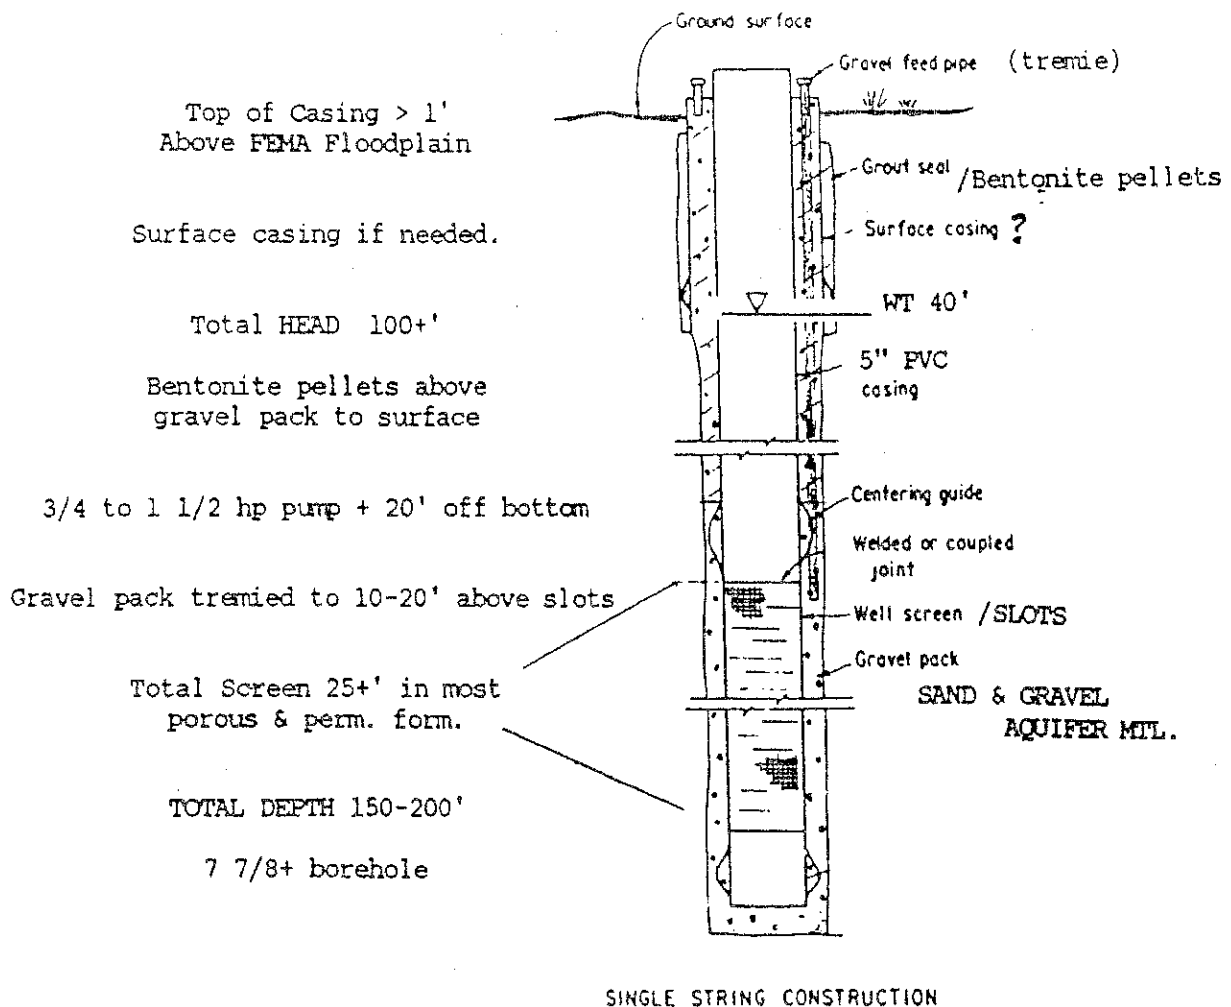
Gravel packed, rotary drilled well for single string construction. 103-D-1488.
